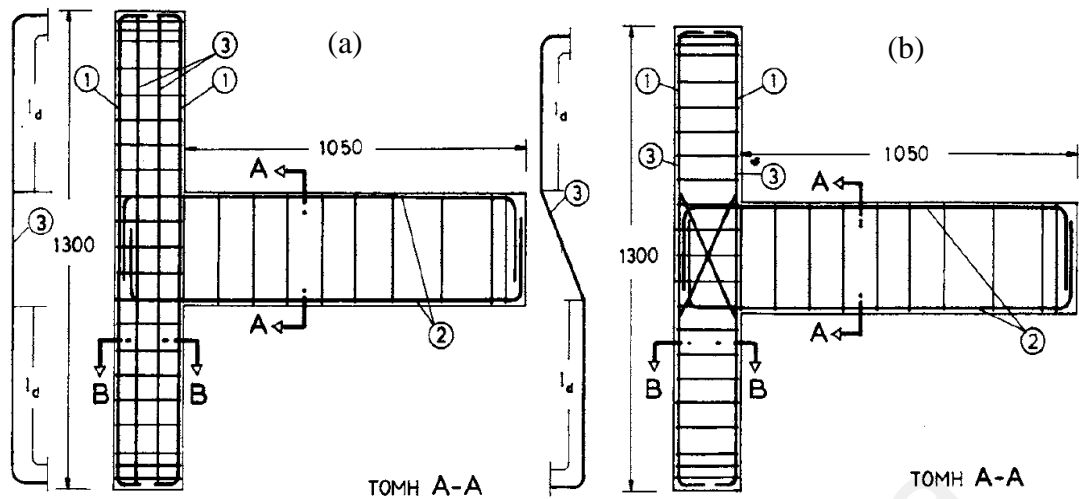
Reinforcement details of beam-column joint (a) conventionally reinforced (b) reinforced with crossed inclined bars (Tsonos et al., 1992)
